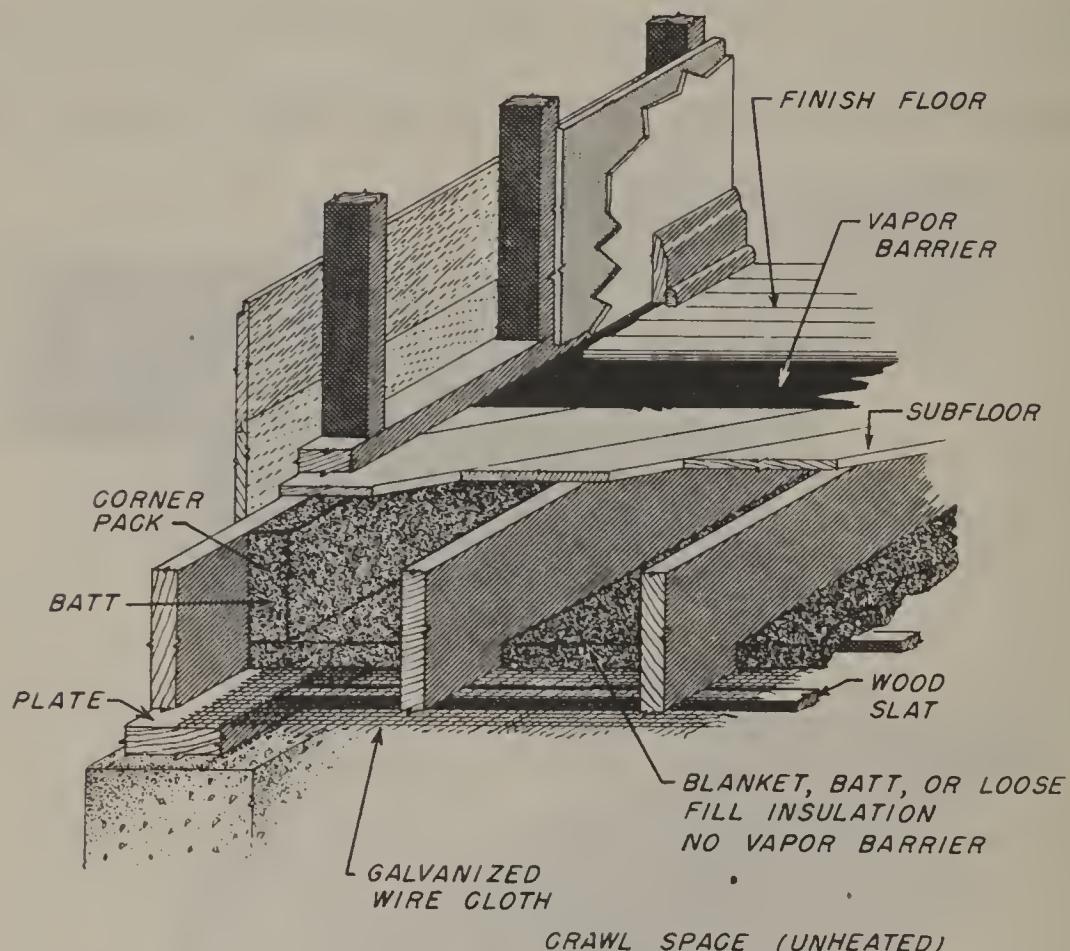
Basementless house, floor detail No. 1.* Because the lower or cold side of the floor construction in this detail is permeable, a vapor barrier is not required for condensation control. However, since the crawl space may in some instances become damp it would be possible for the finish floor to absorb too much moisture and cause buckling or other damage. A vapor barrier is therefore indicated between the finish floor and subfloor. Blanket, batt, or loose-fill type thermal insulation without a moisture barrier is shown supported on galvanized wire cloth and wood slats nailed to the lower edge of the joists. Batts enclosed in paper should be supported on wood slats since the use of stapled, paper flanges are unreliable where damp conditions may exist continuously or even occasionally. Galvanized wire mesh is recommended where lightweight batt, blanket insulation, or fill insulation is used. The wire mesh should be small enough to retain fill material or a kraft or other paper (not shown) can be laid over larger mesh wire cloth. Note the special corner pack along the outside wall which should be thick enough to support itself permanently. If loose fill is used the corner pack should be supported on the plate. Where corner packs are used it is especially important that the crawl space be well vented and that soil covers (fig. 15) be used in wet locations to prevent condensation on the sill behind the insulation. Condensation in such a situation would not be removed rapidly and would tend to cause a decay hazard.
